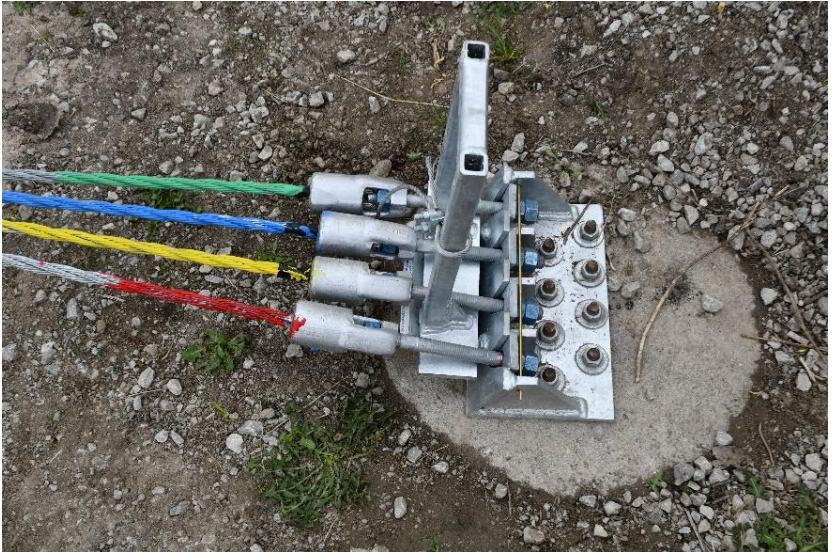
System Installation – Upstream Anchorage, Test No. MTP-1
